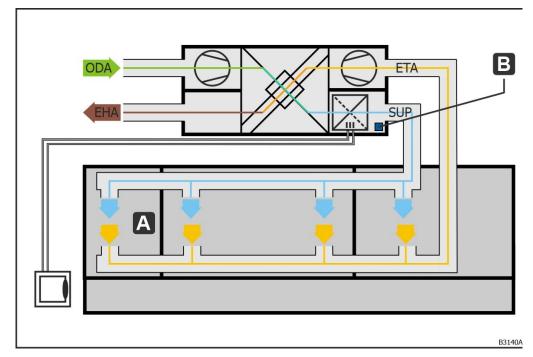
AHU with split outdoor unit and ventilate rooms with refrigerant sensor
